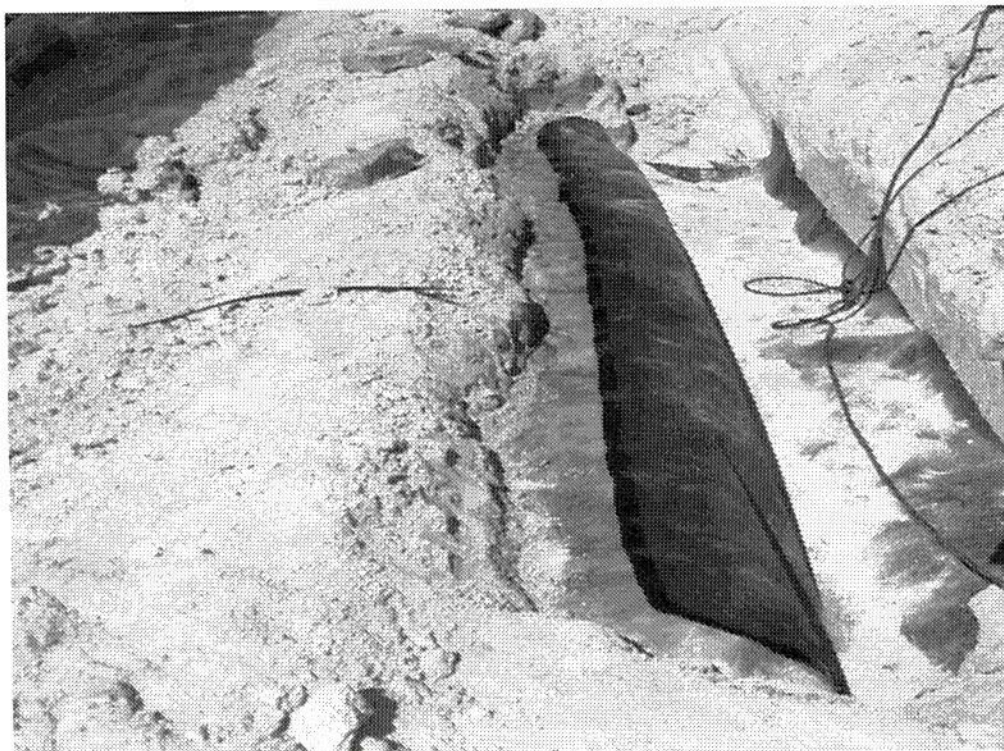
Liner seamer extrusion welding new liner material to existing liner panel at to leading edge of anchor trench, looking northerly
